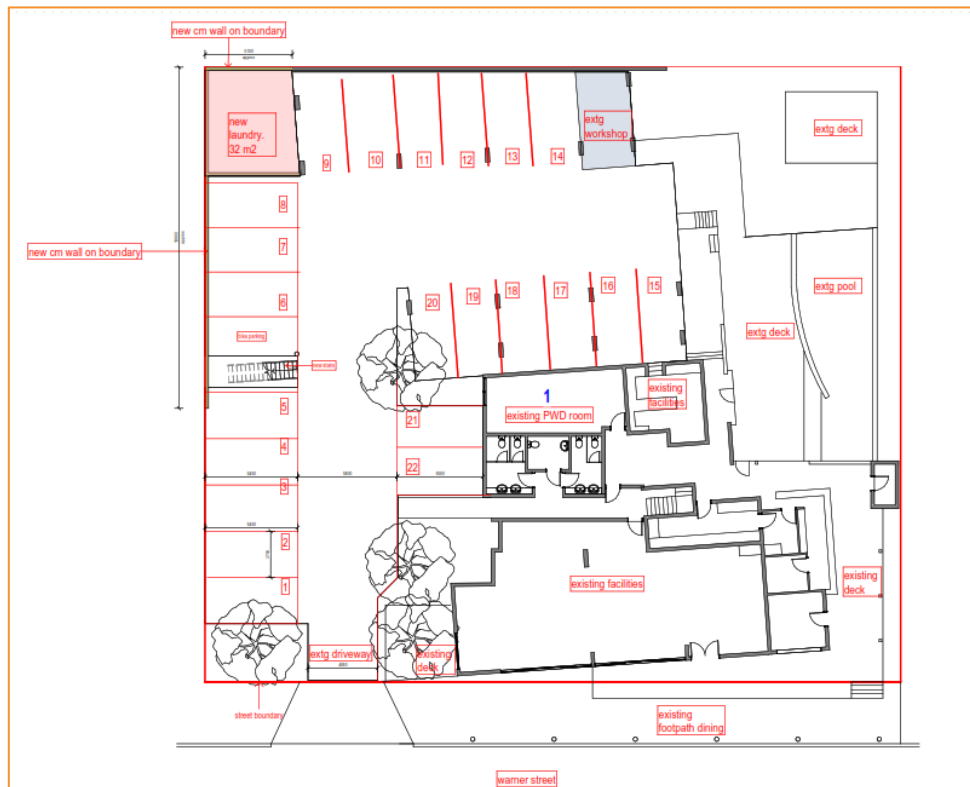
Extract of Proposed 2nd Floor Source: 8 Pencils
